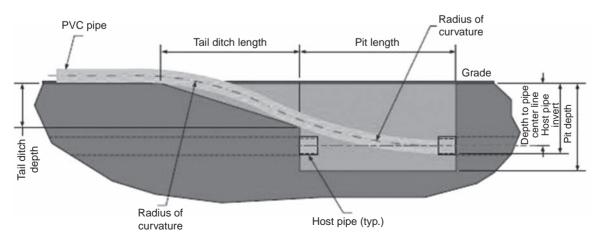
Typical installation pit for continuous sliplined PVC pipe.
